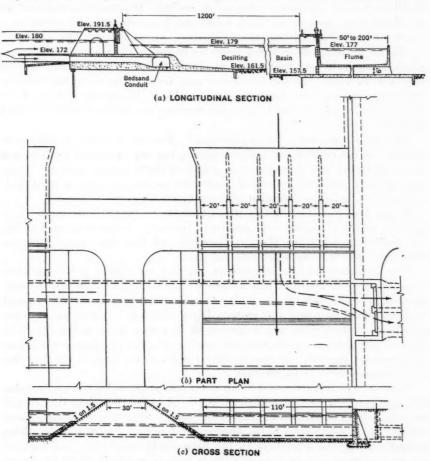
ENLARGED PLAN AND LONGITUDINAL SECTION OF DIVERSION WORKS WITH DESILTING BASINS.
